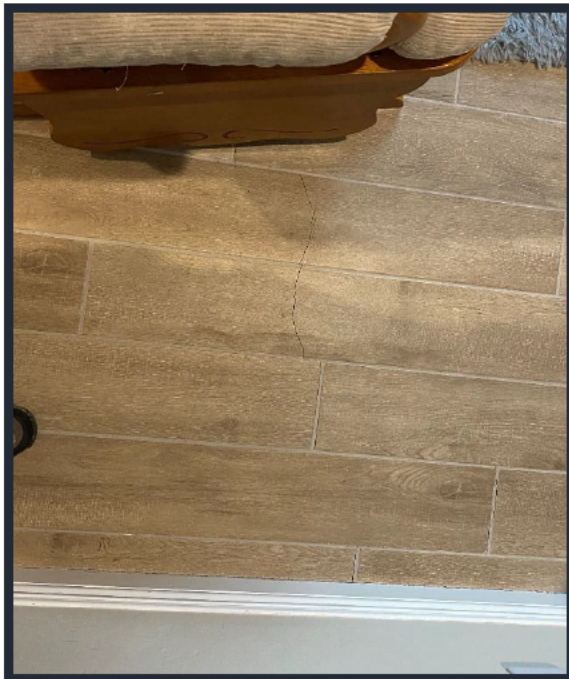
Lot 19, evidence of slab cracking reflecting on the tiles inside the existing home
